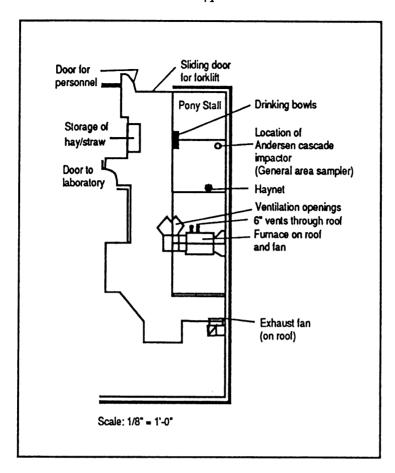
Floor plan of the pony barn and the adjoining building, including details of the ventilation system.
